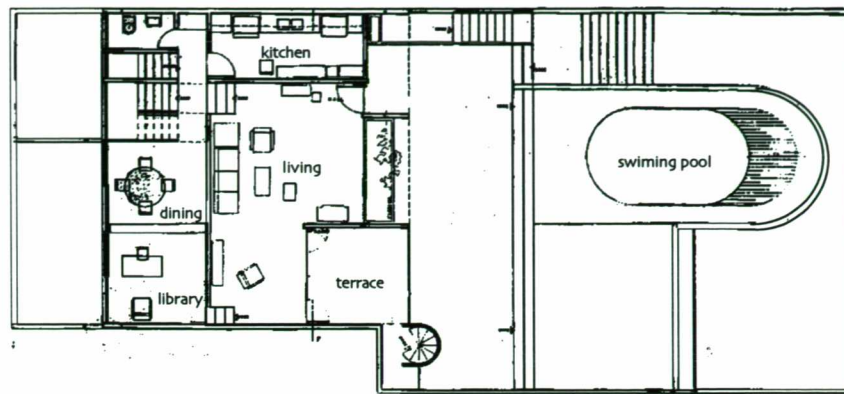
Rosa Borges House (M160), 1969: ground-floor plan
